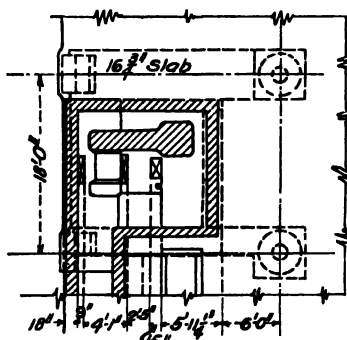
Concrete elevator machinery floor built as part of main roof.
